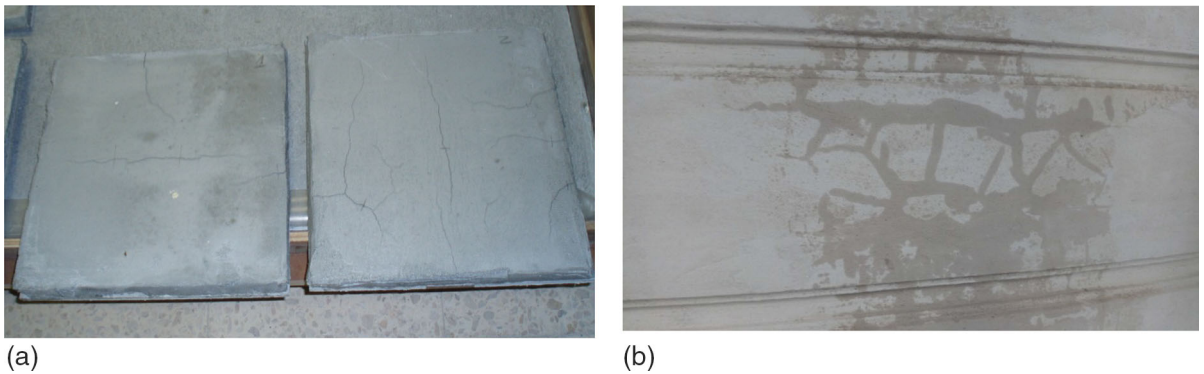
Restrained shrinkage test: (a) Slab test and (b) cracking tendency of a lime mortar applied on a brick wall
